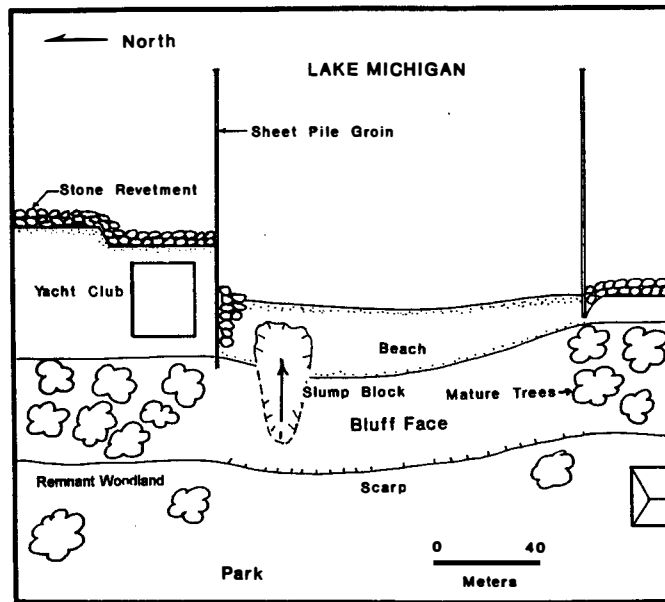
Plan view of Sunrise Park and Beach prior to project construction.
